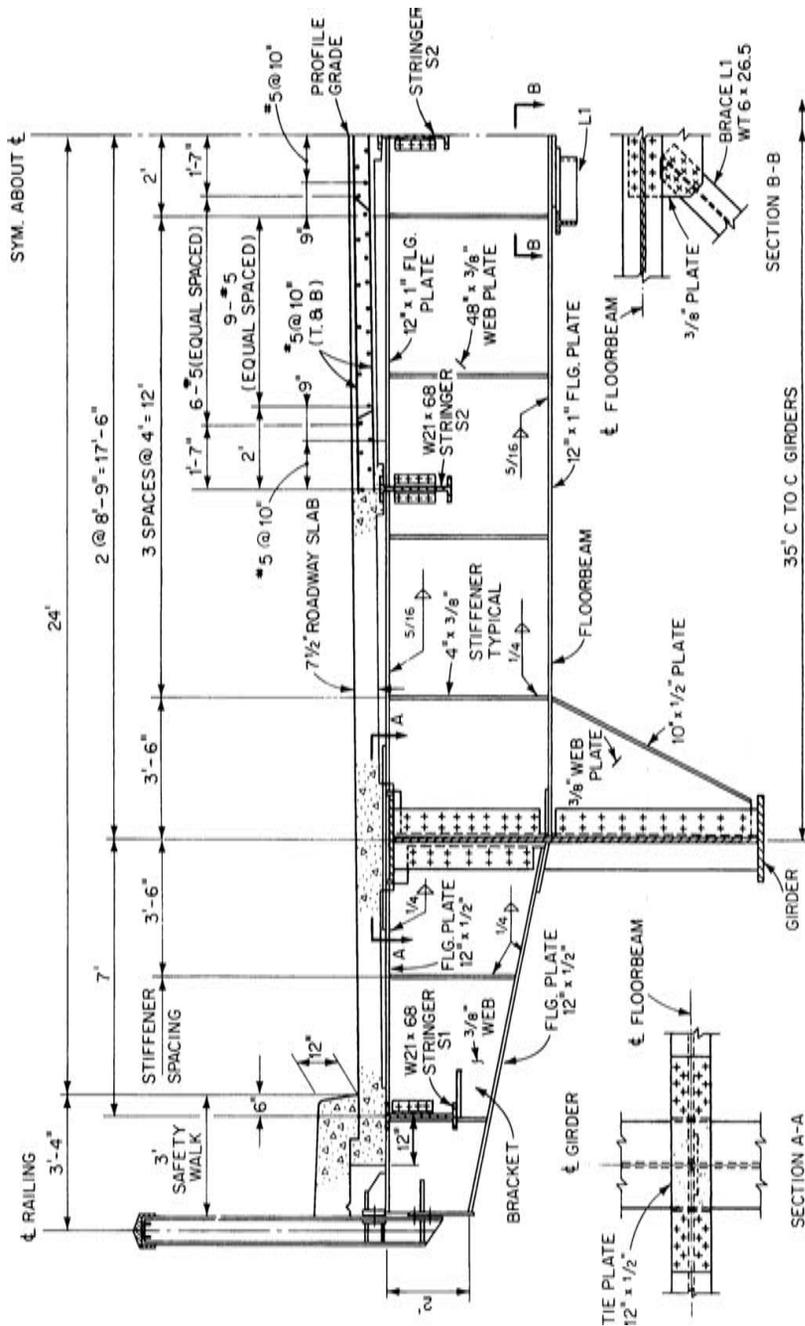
Typical cross section of deck-girder bridge at a floorbeam.
